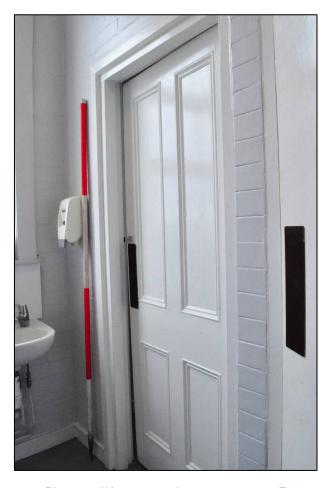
West range, later part, room 1F2 (toilets), door detail, looking SE (photo 1/3001).
